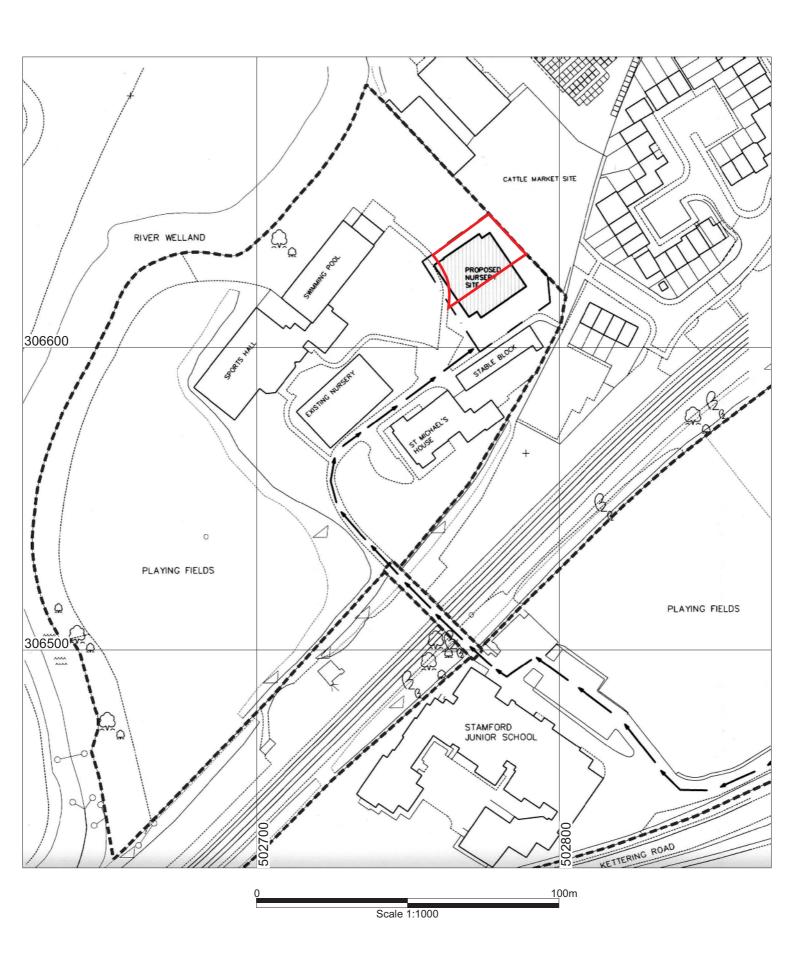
Site location at scale 1:1250, with the excavation area outlined in red
